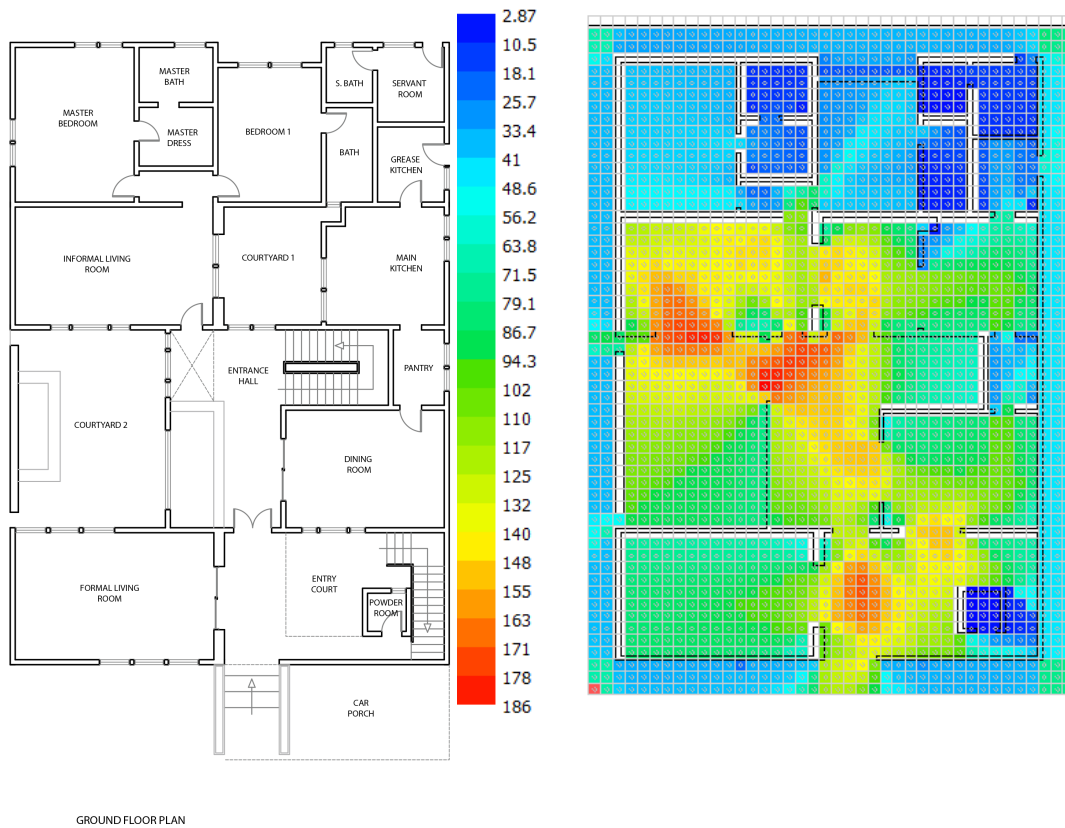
Badr Muneer Residence - Ground Floor Plan & Visibility Graph.
